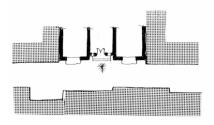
Building edge in the traditional city of Jeddah through stair seats and street windows (Scott & Mason, 1946, p. 159).
